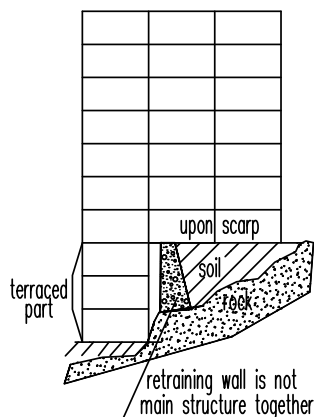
Terraced structure diagram(Retaining wall is not connected with the main structure)
